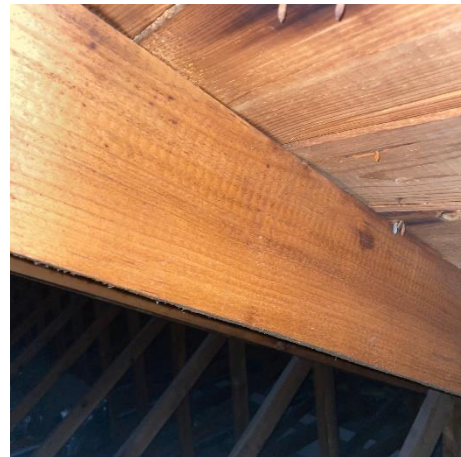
Joist framing at previous vertical plumbing line. Joist has been notched.
